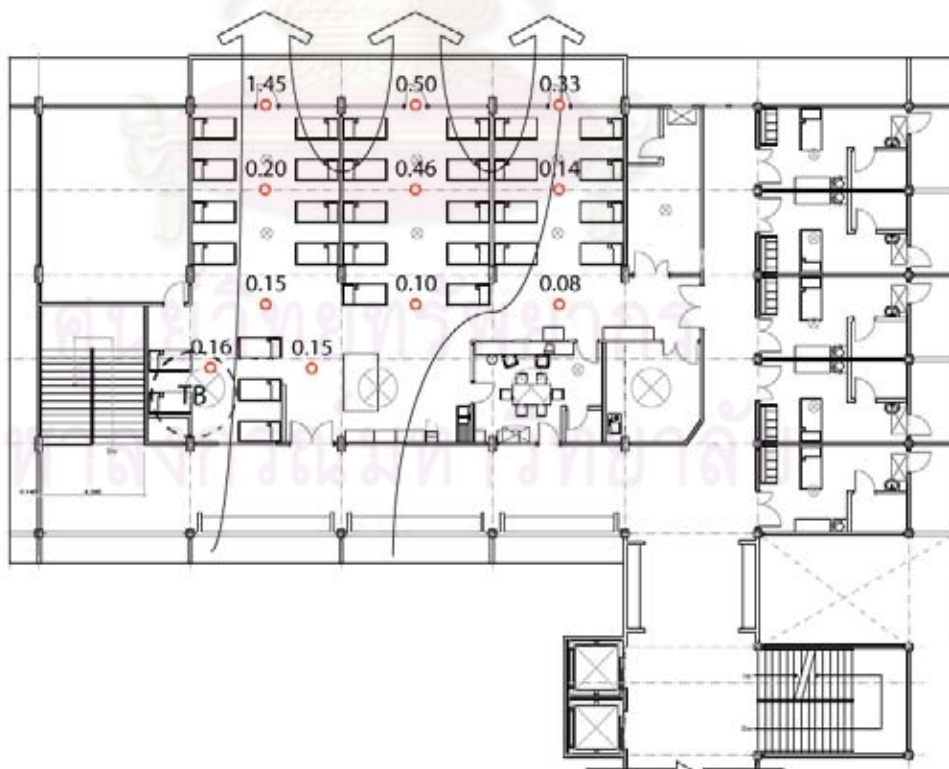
Floor plan and ventilation data of hospital E inpatient ward
